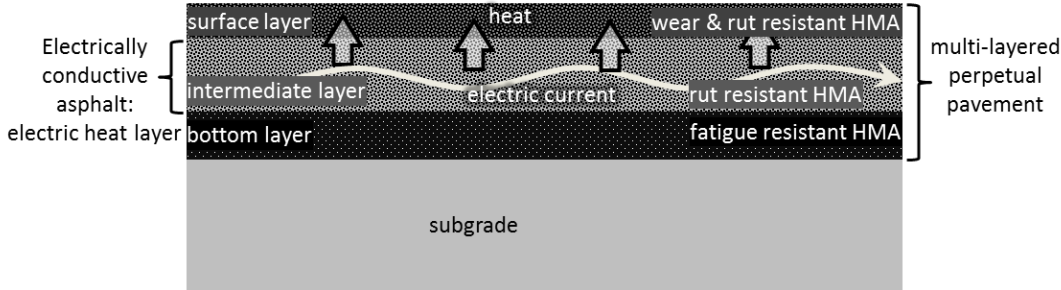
Structural design of perpetual pavement containing electrically conductive asphalt layer
